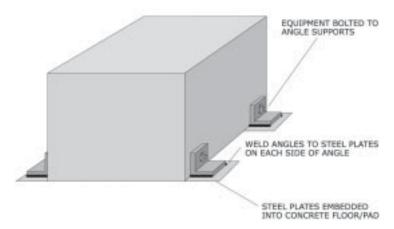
Four or more angles on each side of equipment welded to embedded plates. Figure 148 (page 128) gives examples of embedded steel plates.
